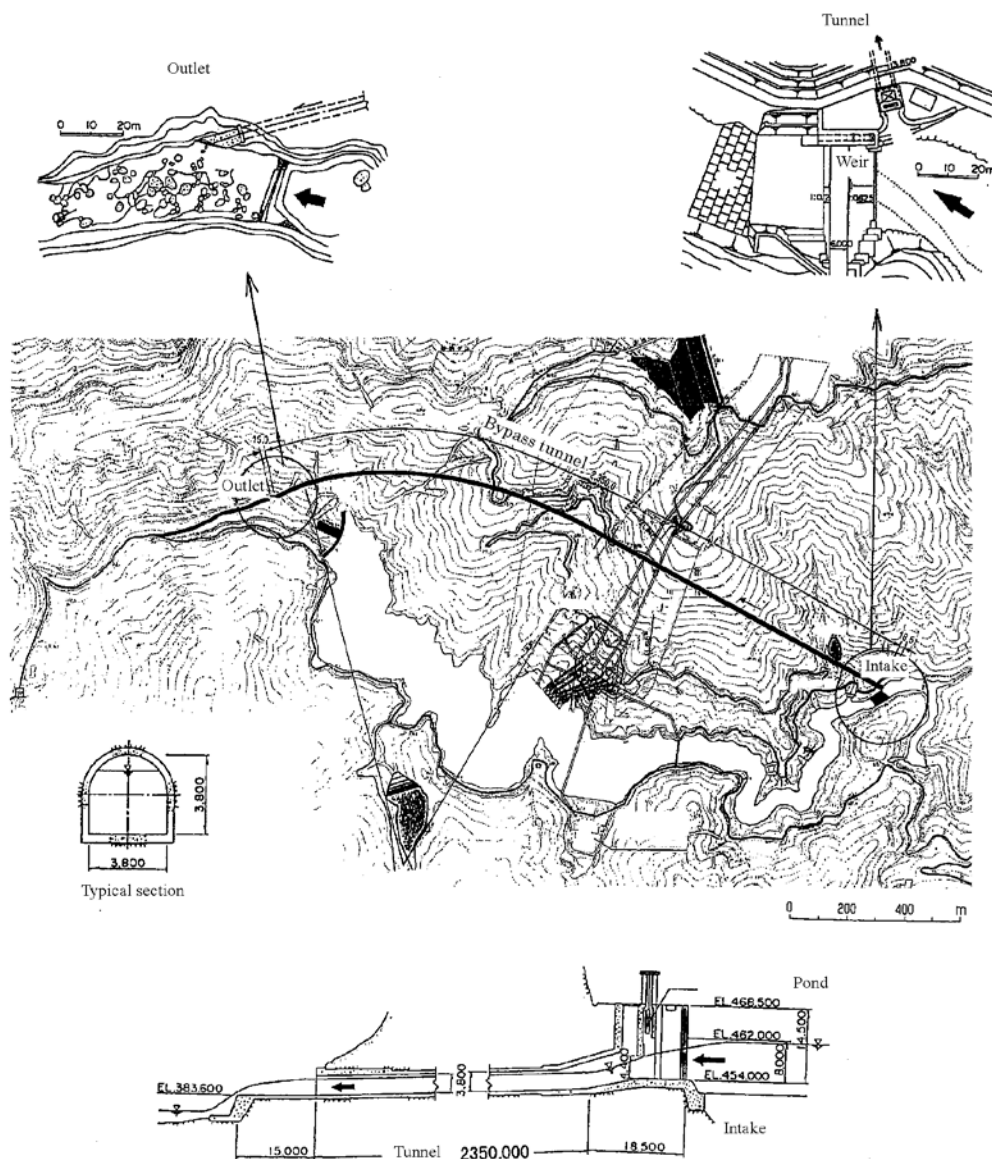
Example of a Bypass Facility (Asahi Dam in Japan)
